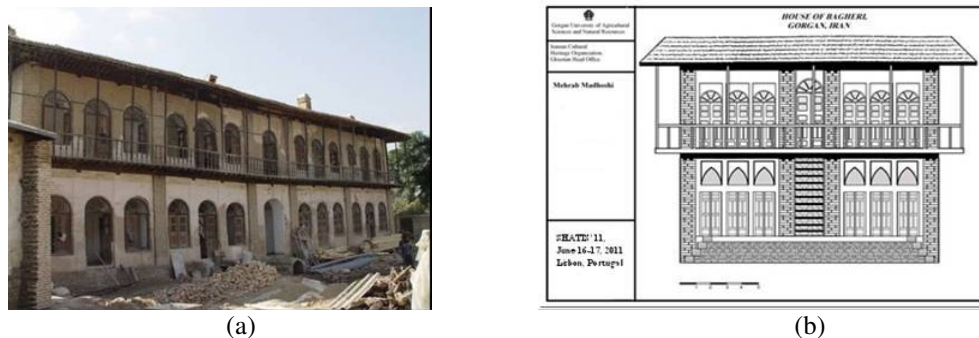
(a) A view from School of Taghavi and (b) A plan of one building in House of Bagheri.
